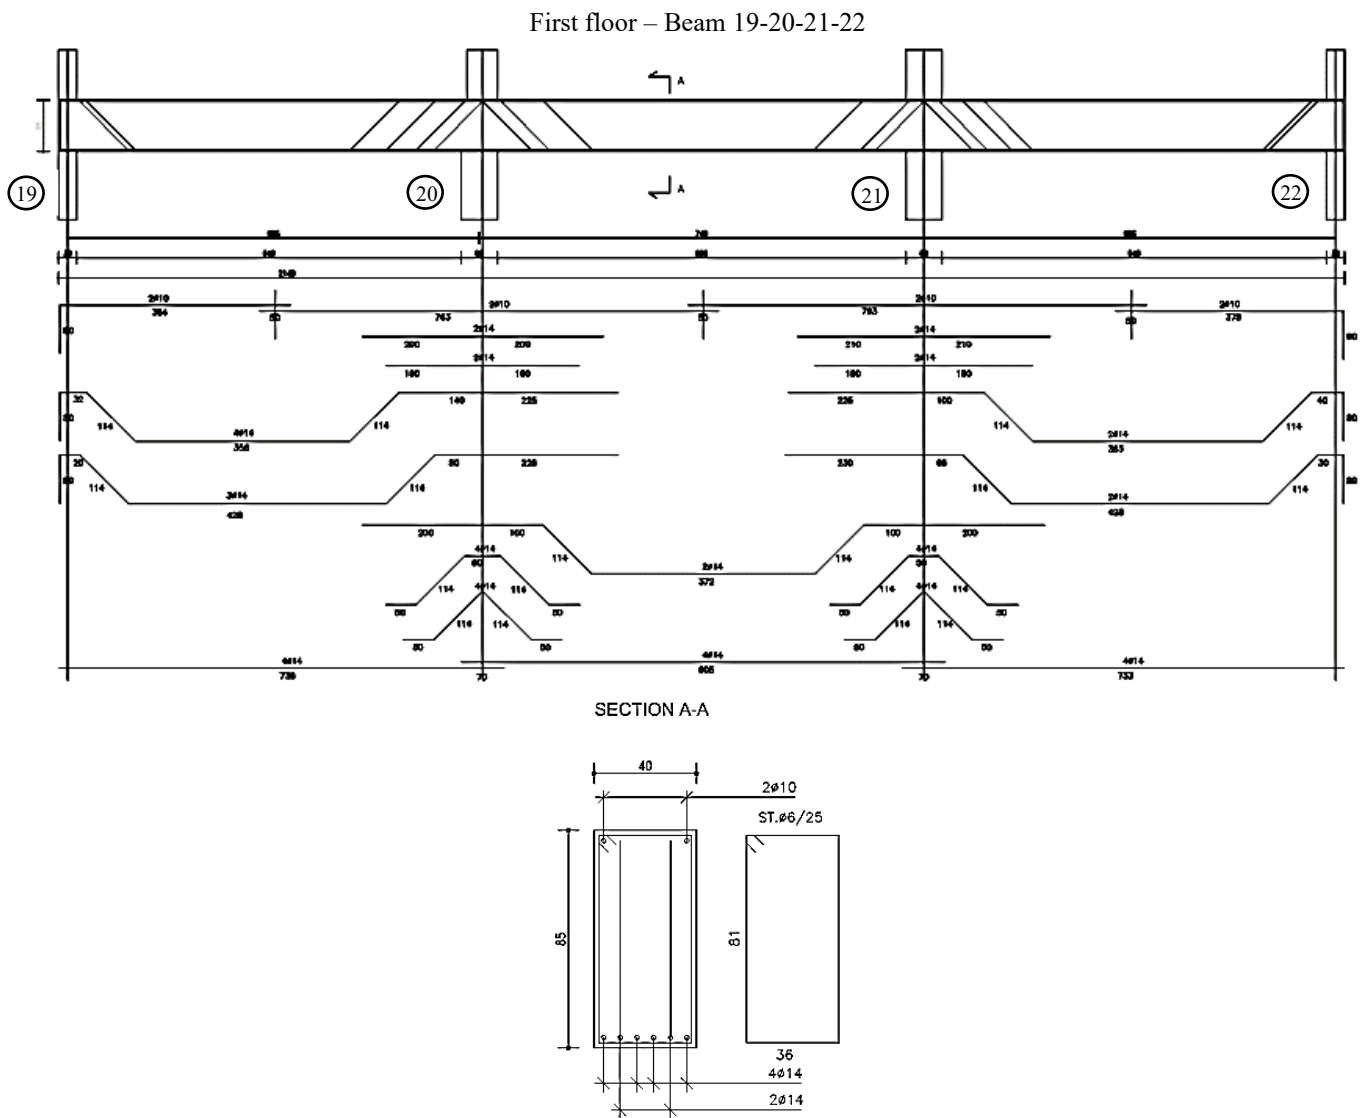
Reinforcements detailing on beams of the 1st and 2nd floors
